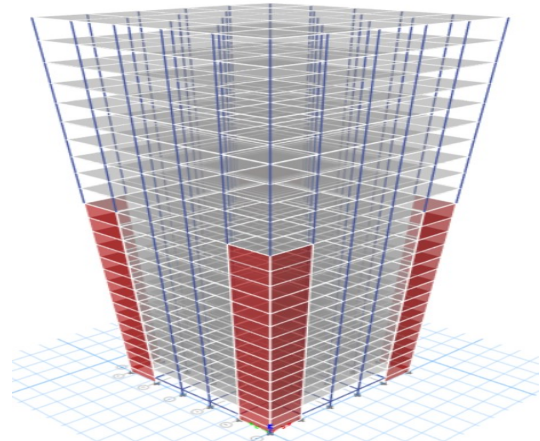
D View of RC framed structure with shear wall (From base to 15th story)
